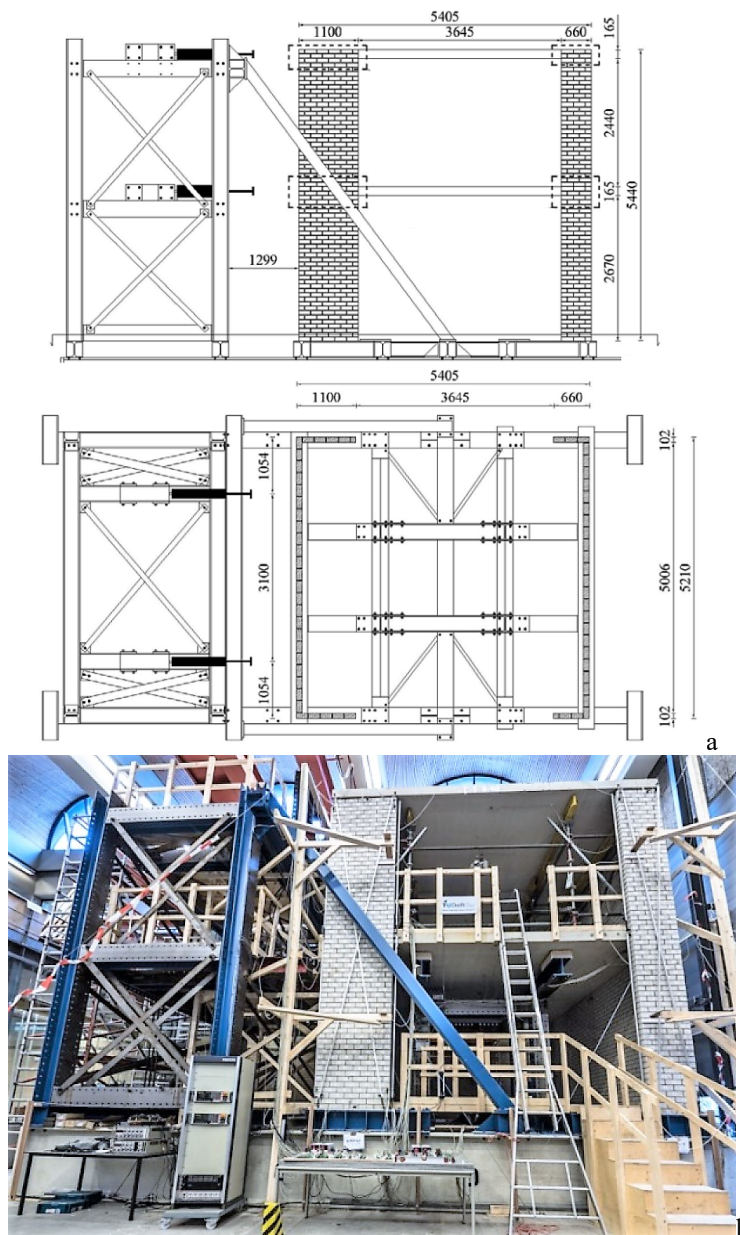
Calcium silicate brick masonry terraced house: sketch of the geometry (a) and photo (b).
